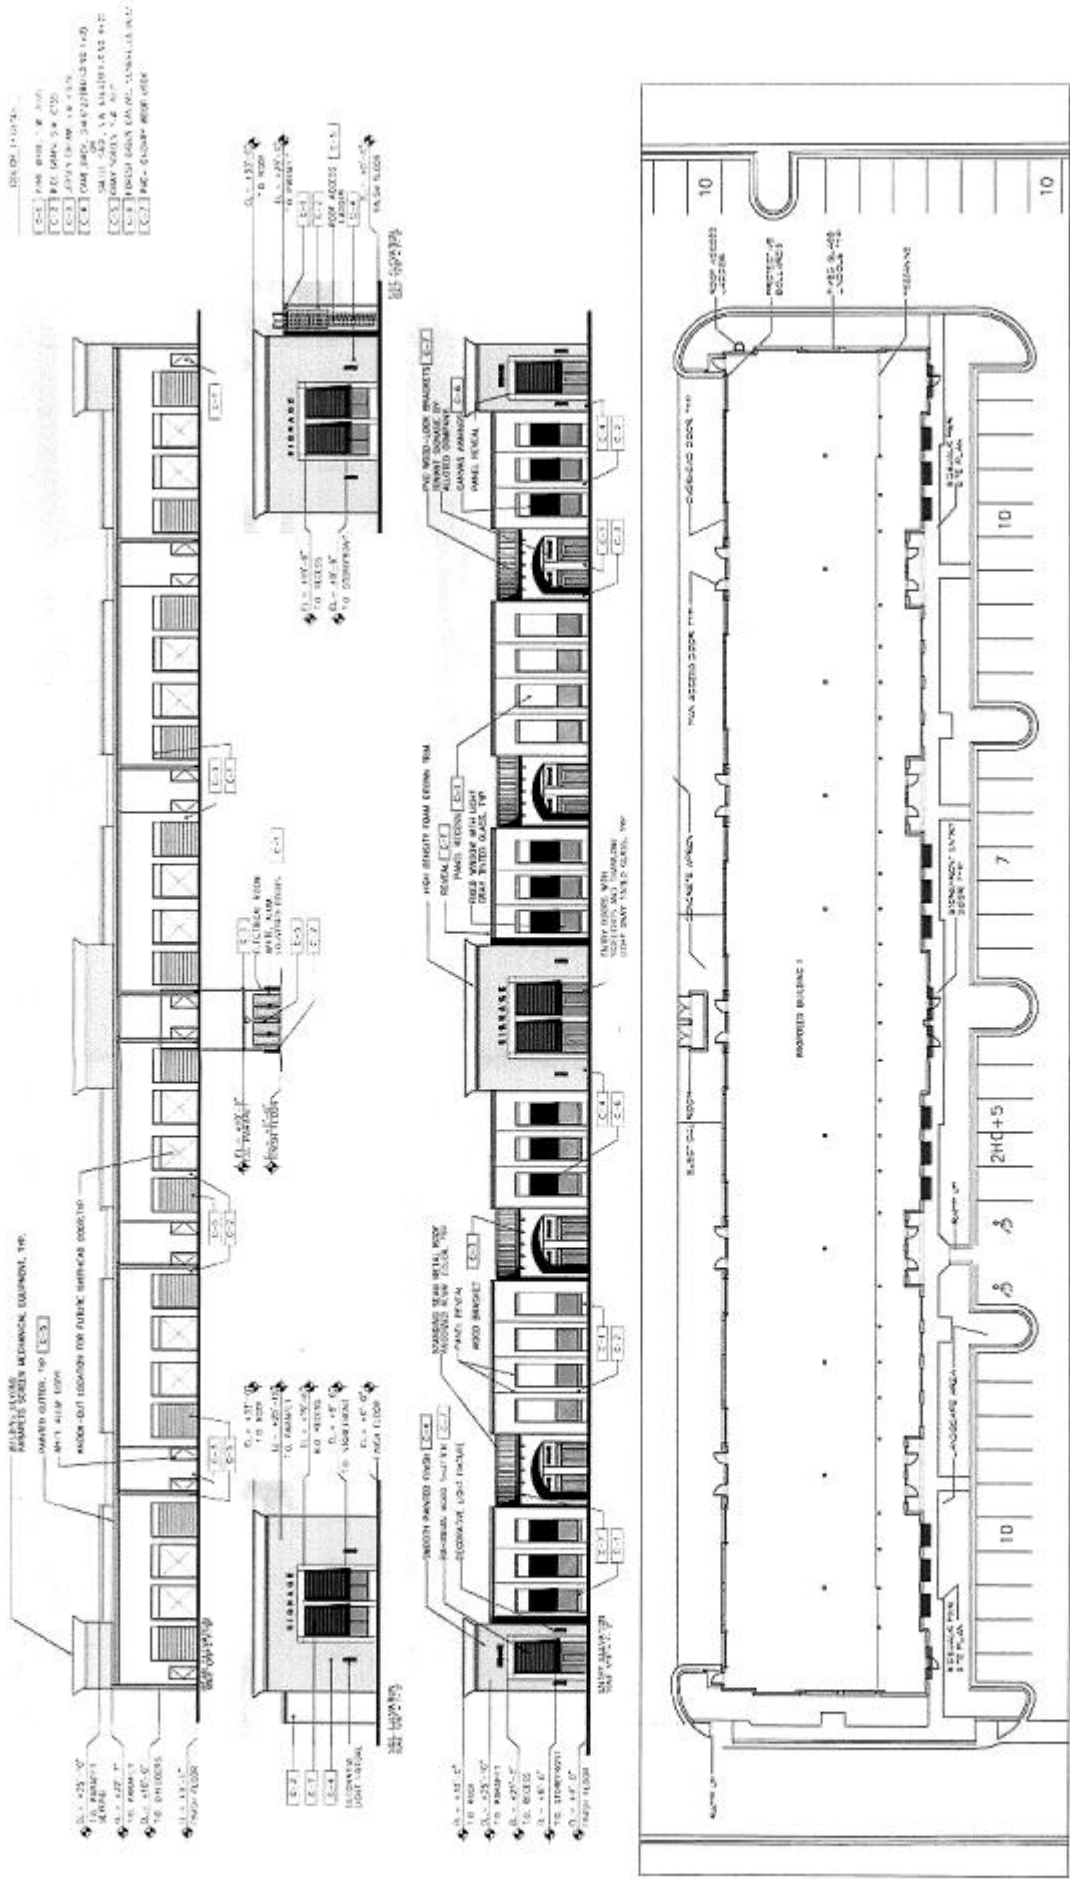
Final Architectural Elevations dated August 16, 2006 (page 1 of 2)
